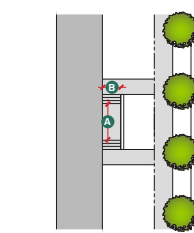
PORCH FRONTAGE PLAN DIAGRAM
